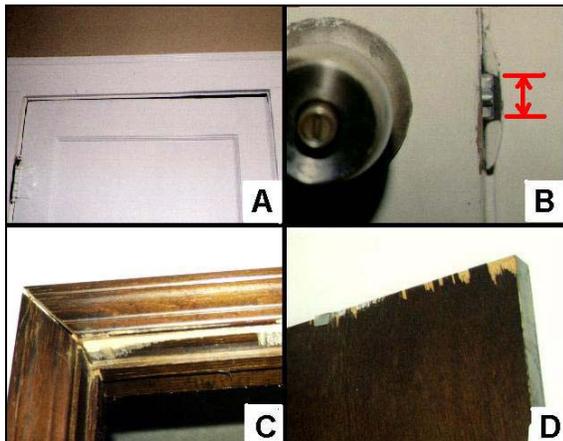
Interior door distress not caused by wind effects: A) gap at top of door yet side of door fits well, B) no relative movement between door latch and painted striker plate, C) wear marks on door frame, and D) evidence that top of door was planed.
